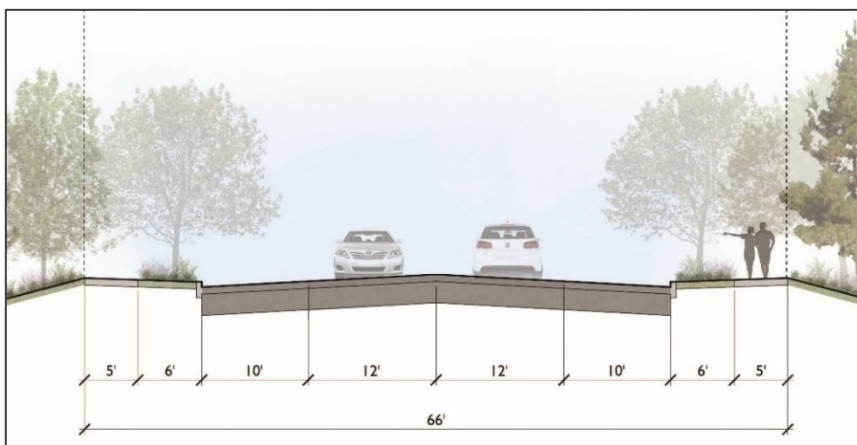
Modified Local Street - Frontage Road Cross Section (30<sup>th</sup> Street)
